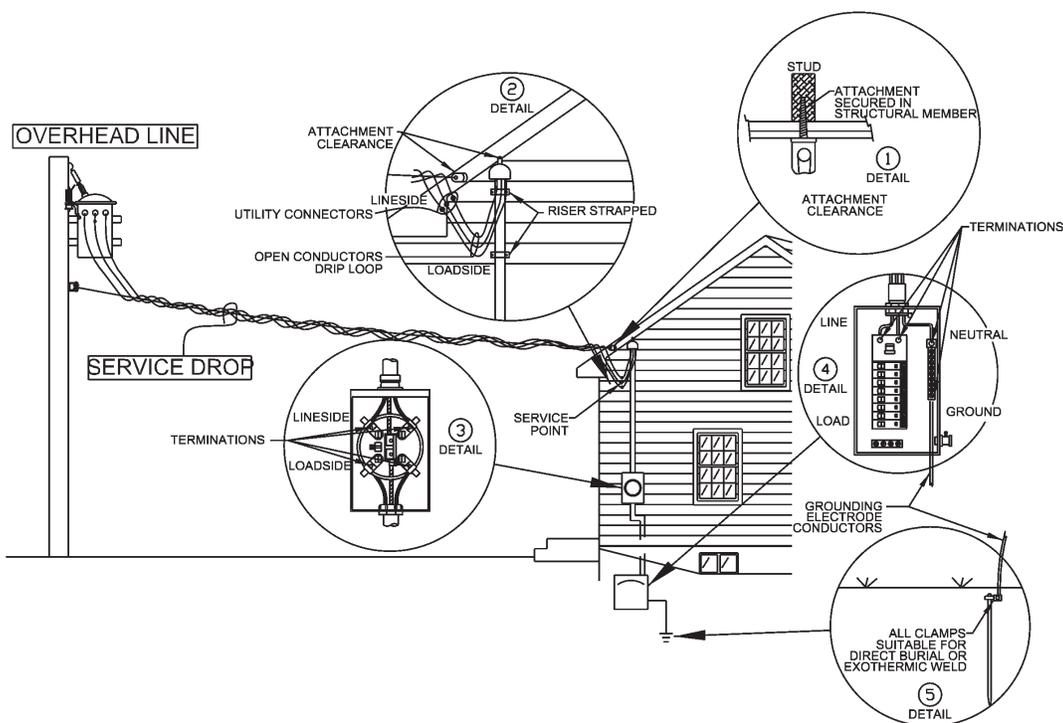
Typical Overhead Service Installation under 600V
